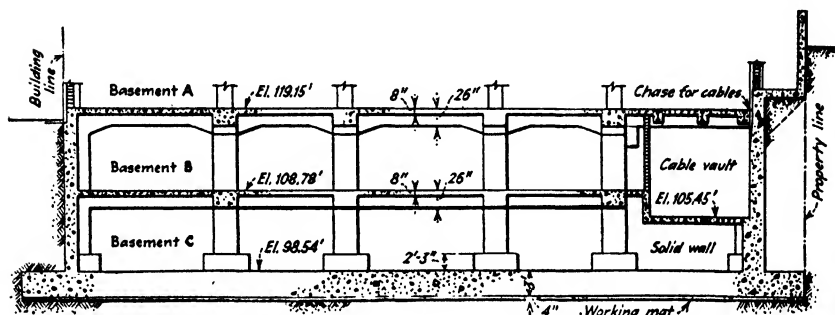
Cross Section of Rigid-frame Foundation for Main Telephone Building in Albany, N. Y.
